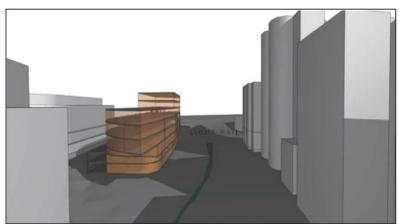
Building Envelope Viewed Light Rail Corridor (Rear)
